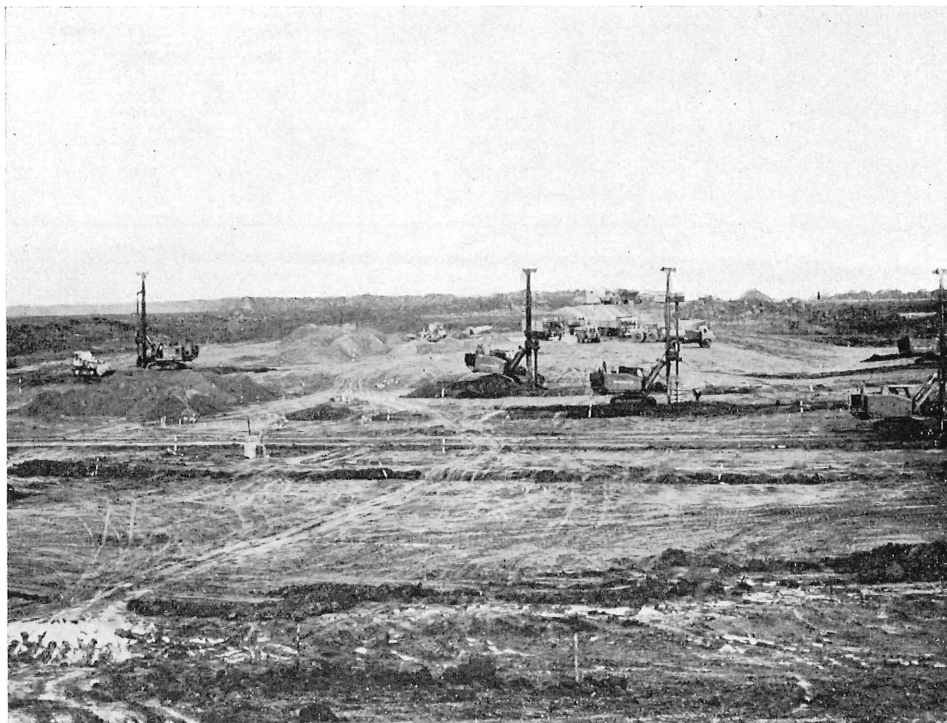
Installation of sand drains in Upper Lias Clay foundation at Empingham.
